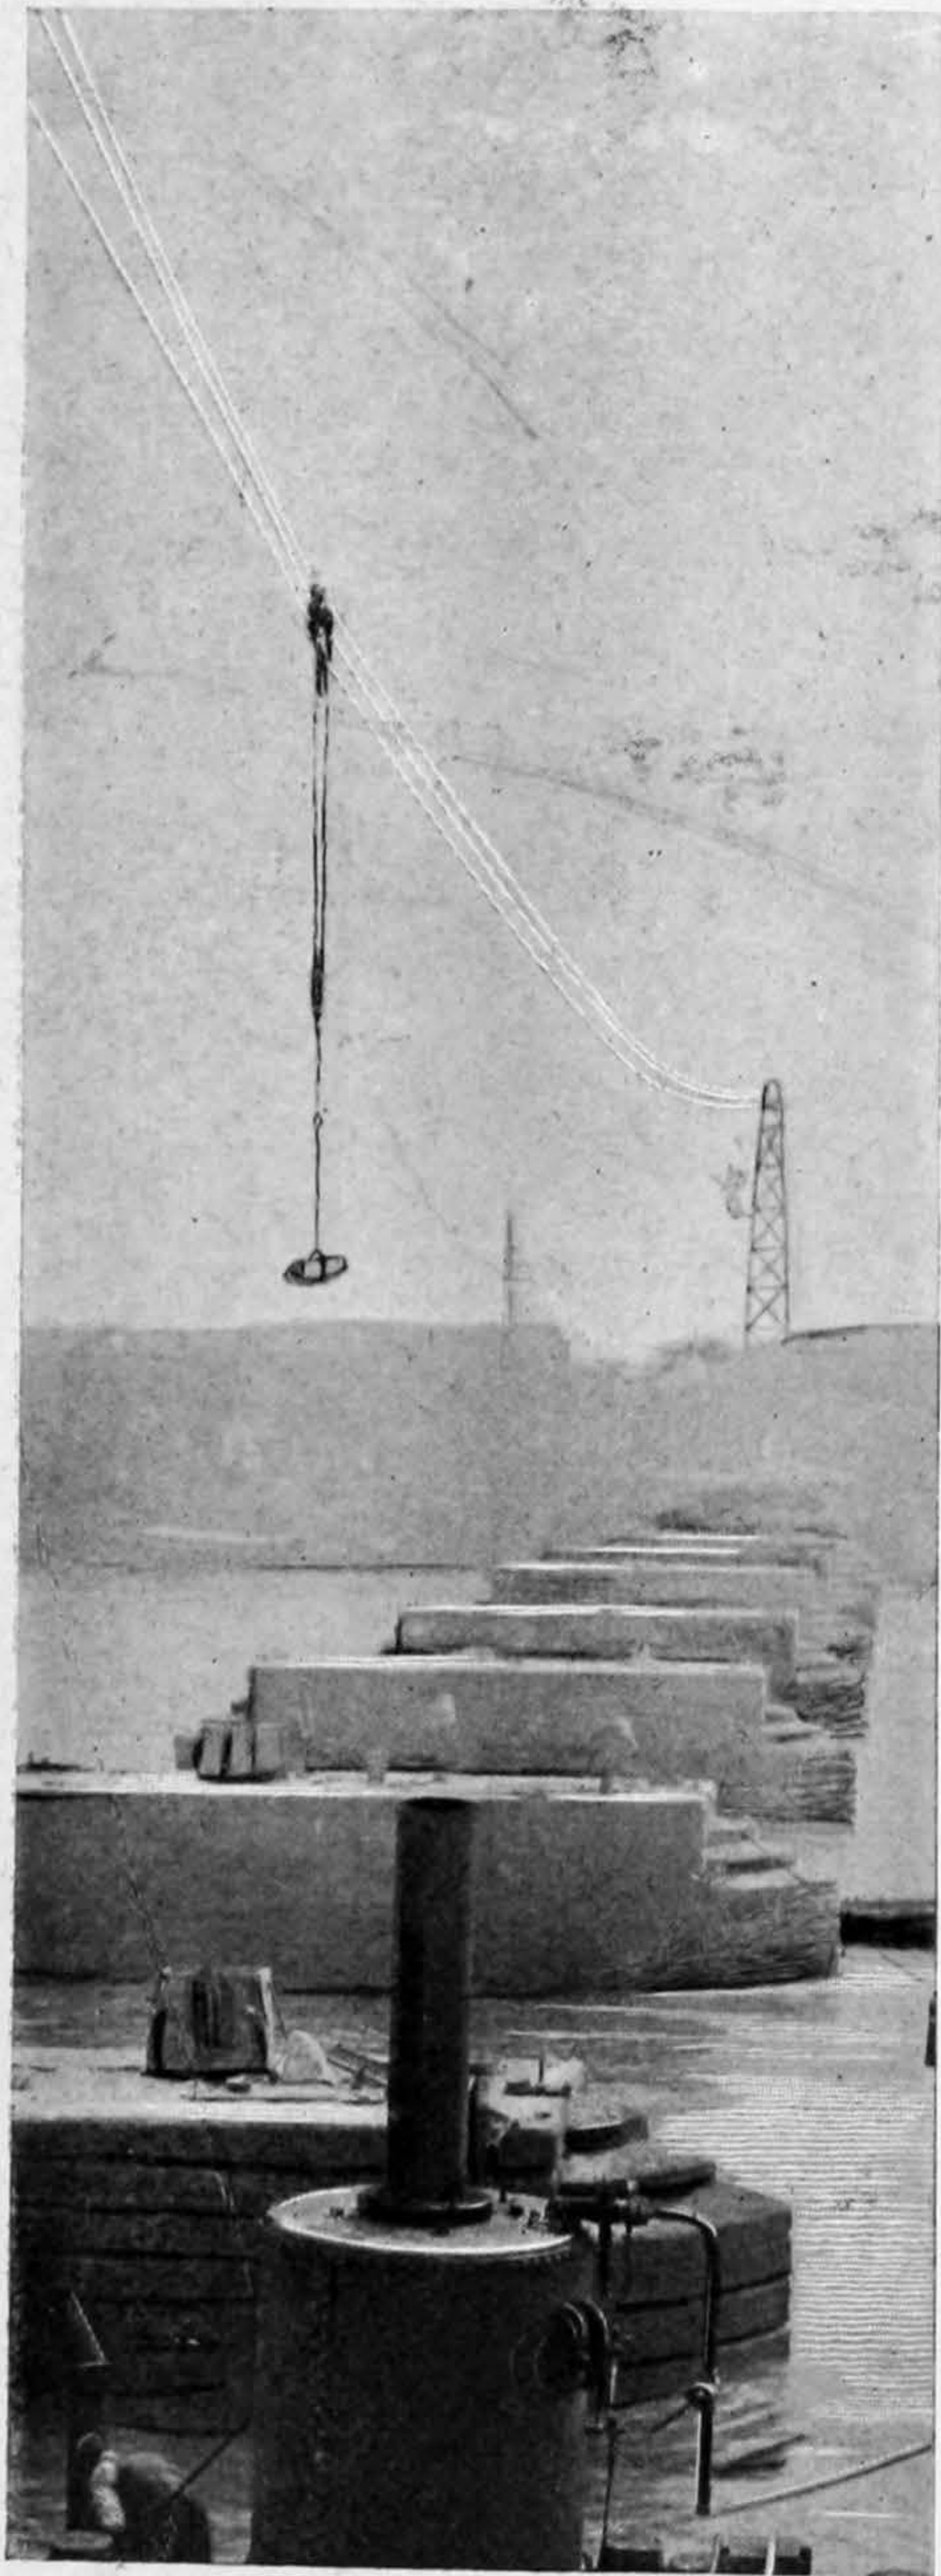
THE VAUXHALL BRIDGE CABLEWAY.
